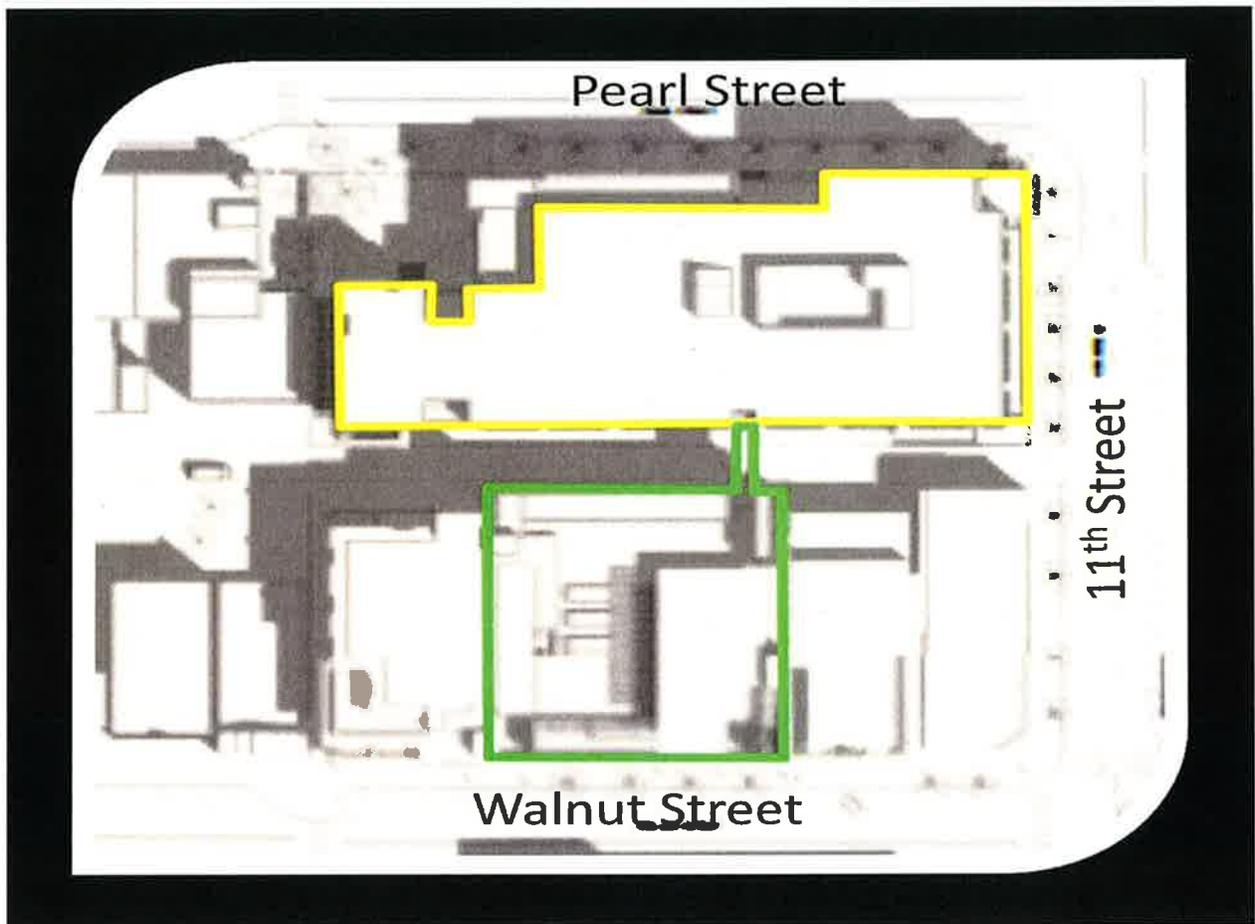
Site Plan Showing proposed building at 1048 Pearl Street (yellow line) and current proposal at 1023 Walnut Street (green line)
